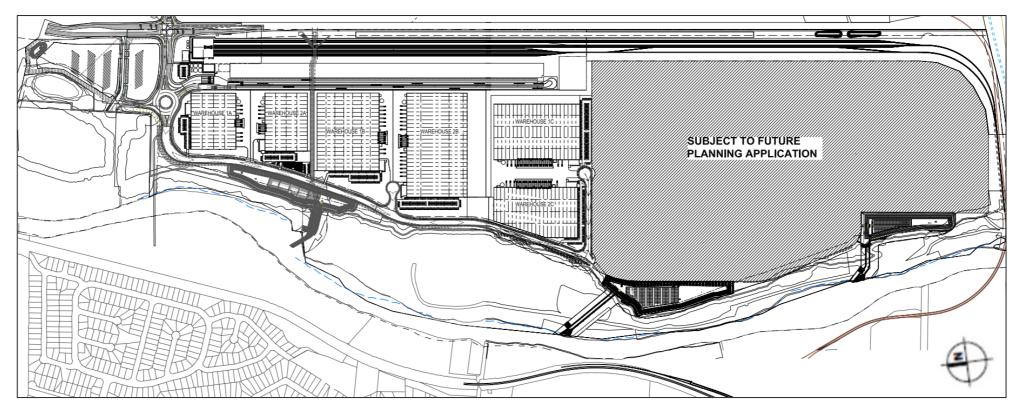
| Original Precinct Plan approved under SSD 5066 and SSD 7709 (Source: Applicant's SSD 5066 MOD 2 report)
